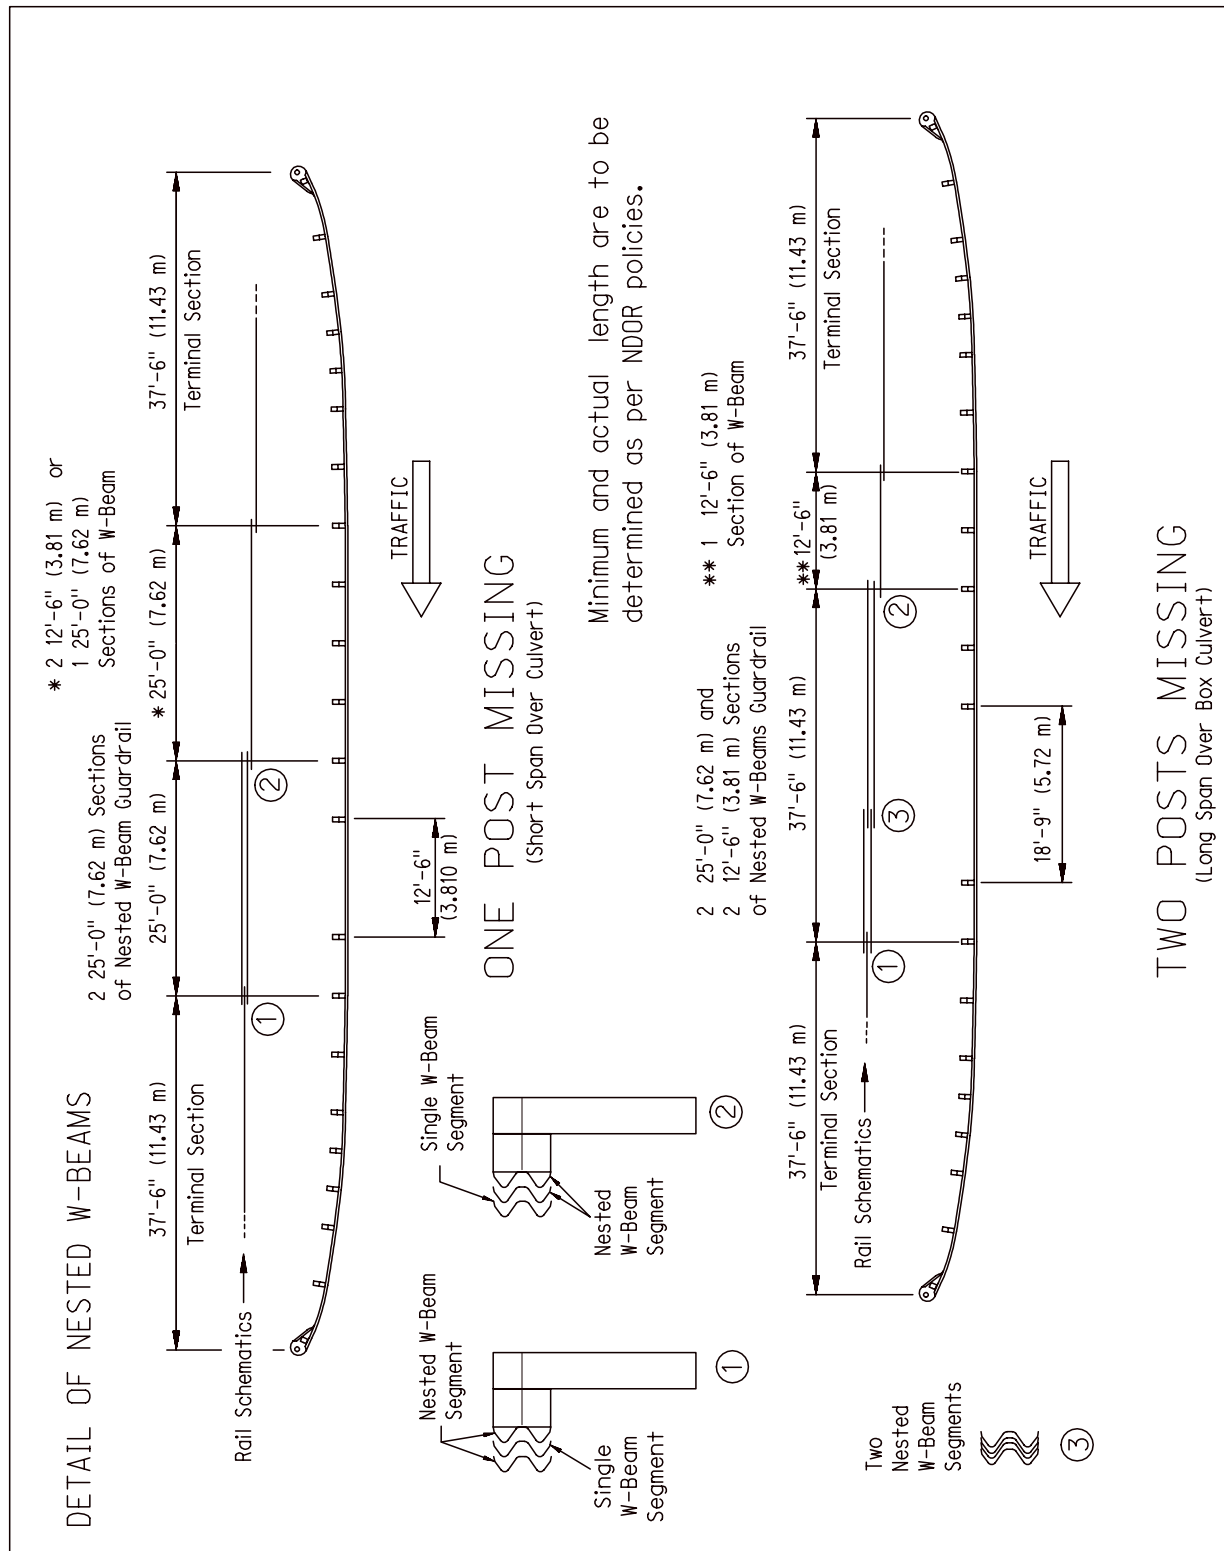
Guardrail Over Low Fill Culverts – Nested
